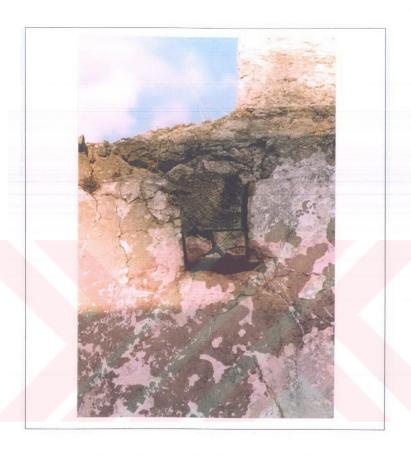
Trace of the Main Beam of the Roof (D.11.10)
